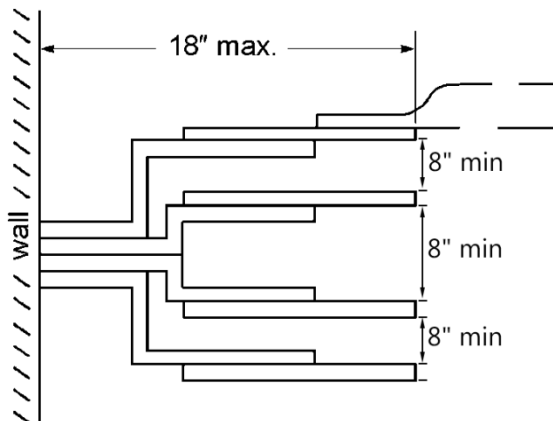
Bus Bars Perpendicular to Floor, Elevation View (Cables Parallel to Floor)
